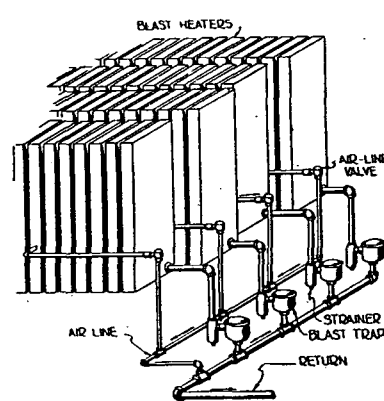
TYPICAL CONNECTIONS TO BLAST COILS EXCEEDING 12 SECTIONS
